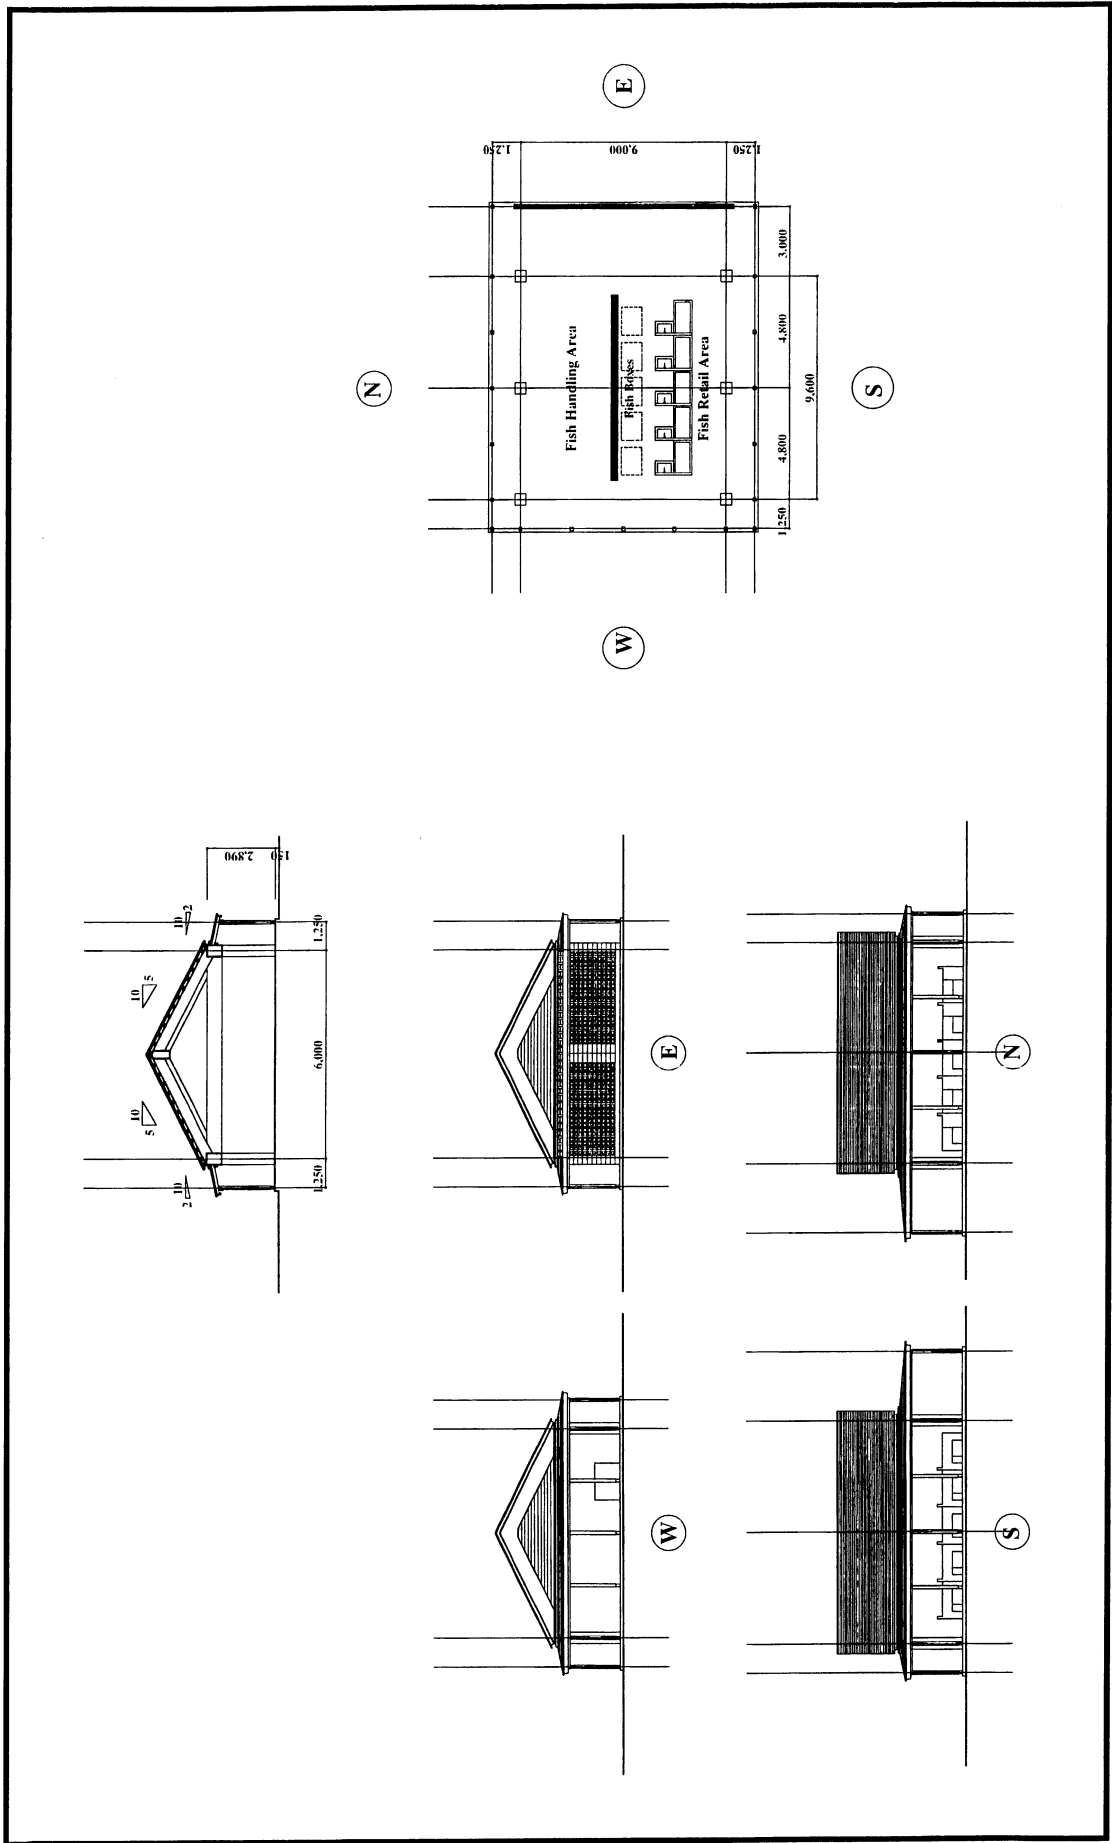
Plan / Section of Fish Retail Shop
